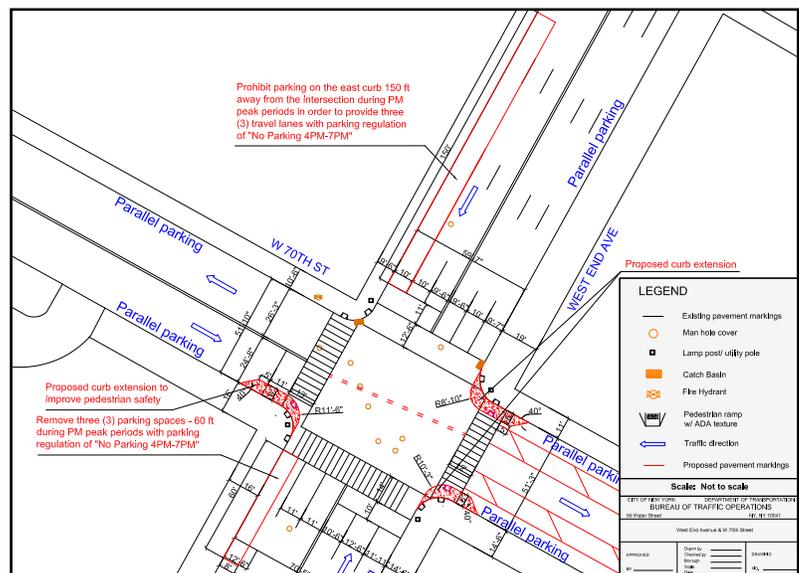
Proposed Lane Configuration on West End Ave & West 70th Street (SB Approach)
